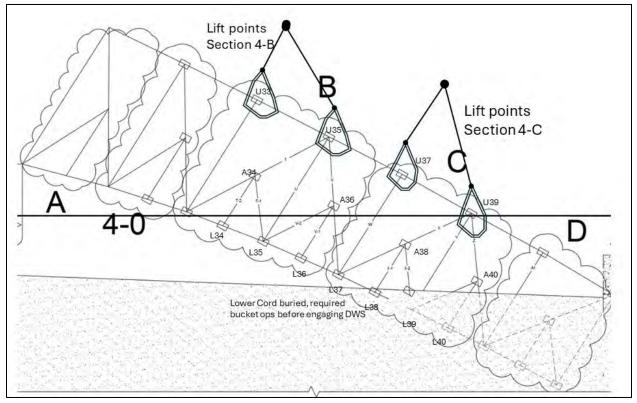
Drawing from Lift Plan shows truss 4 planned lifts.
